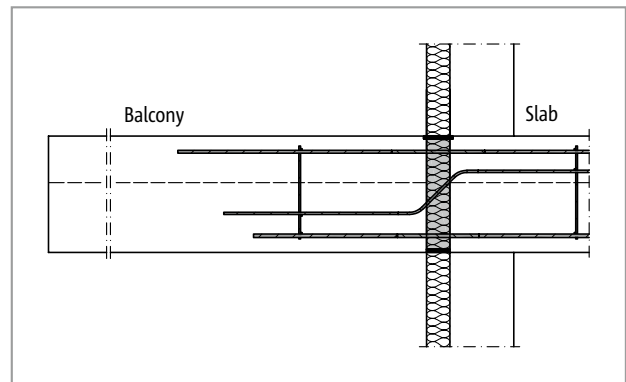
Schöck Isokorb® T type B: Balcony structure with freely cantilevered downstand beams (precast balcony)
